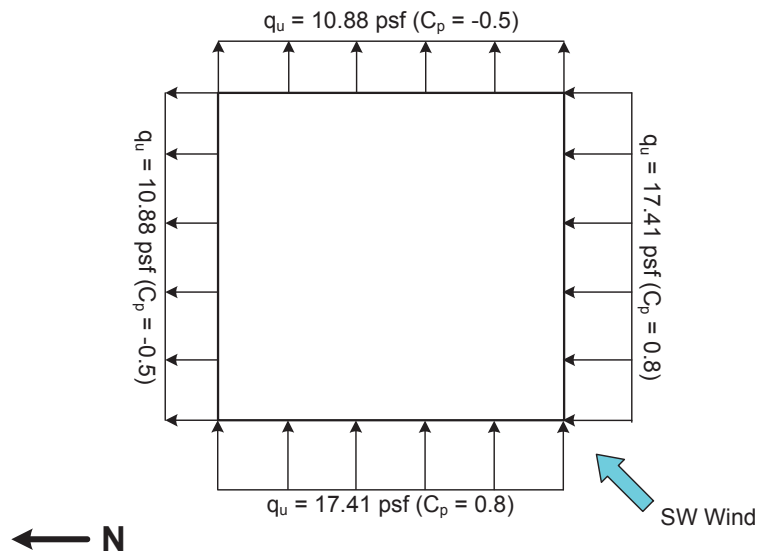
Case 5 - Wind Loads applied to walls due to southwest wind.
